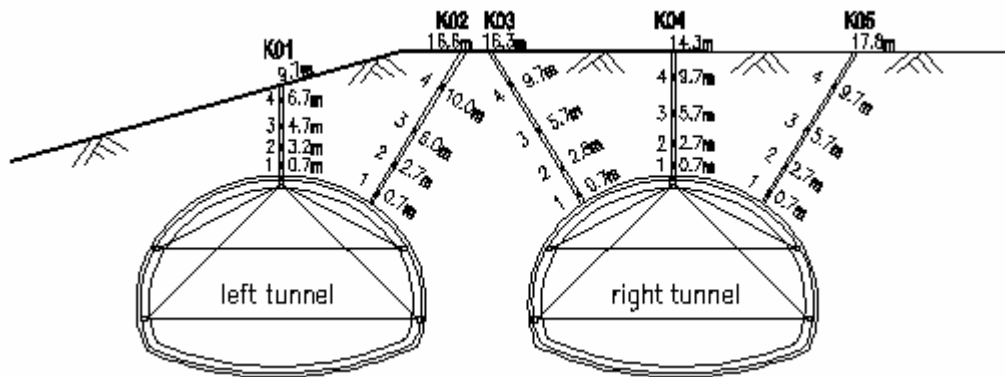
Layout of multiple point extensometers in Heshang tunnel at station K6 + 300.
